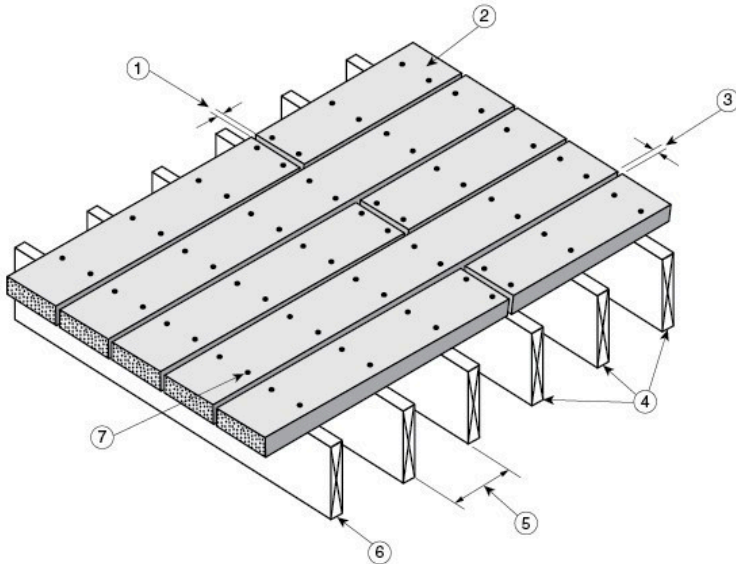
Veranda Wood/Plastic Composite Deck Board with fasteners
